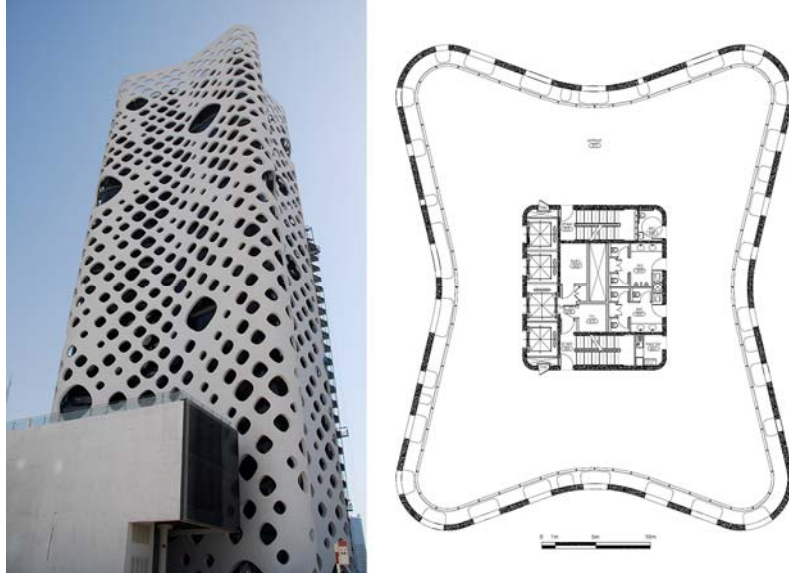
The exterior of O-14, left, illustrating the nature of its perforated diagrid exoskeleton. A typical floor plan of the tower, right, showing the space between the perforated exterior façade and the fully glazed interior layer.
